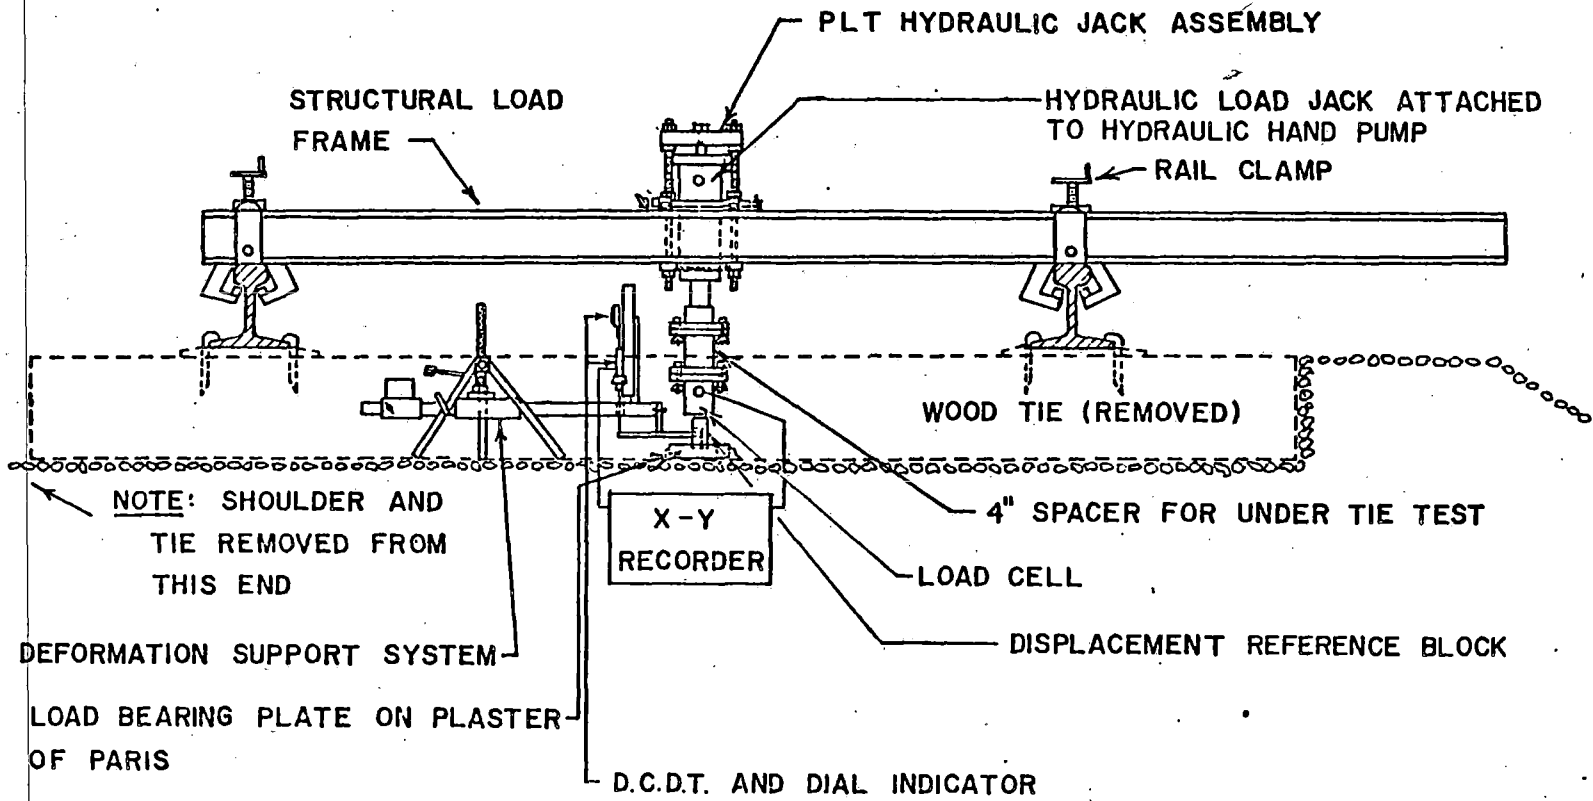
Assembled Plate Load Test Apparatus (Ref. 1)
